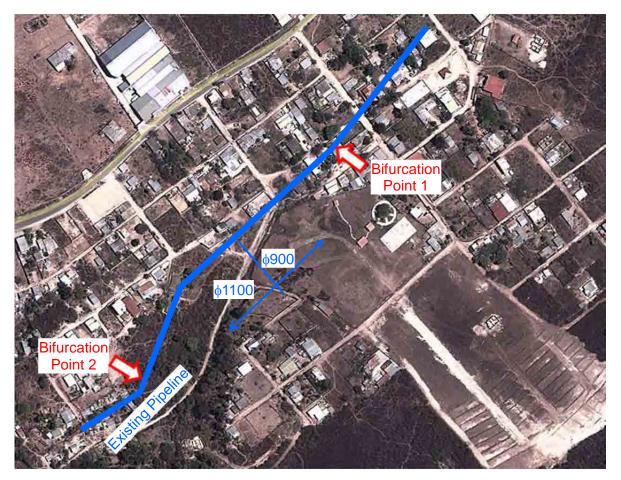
Upstream Bifurcation Point of New Pipeline Route
